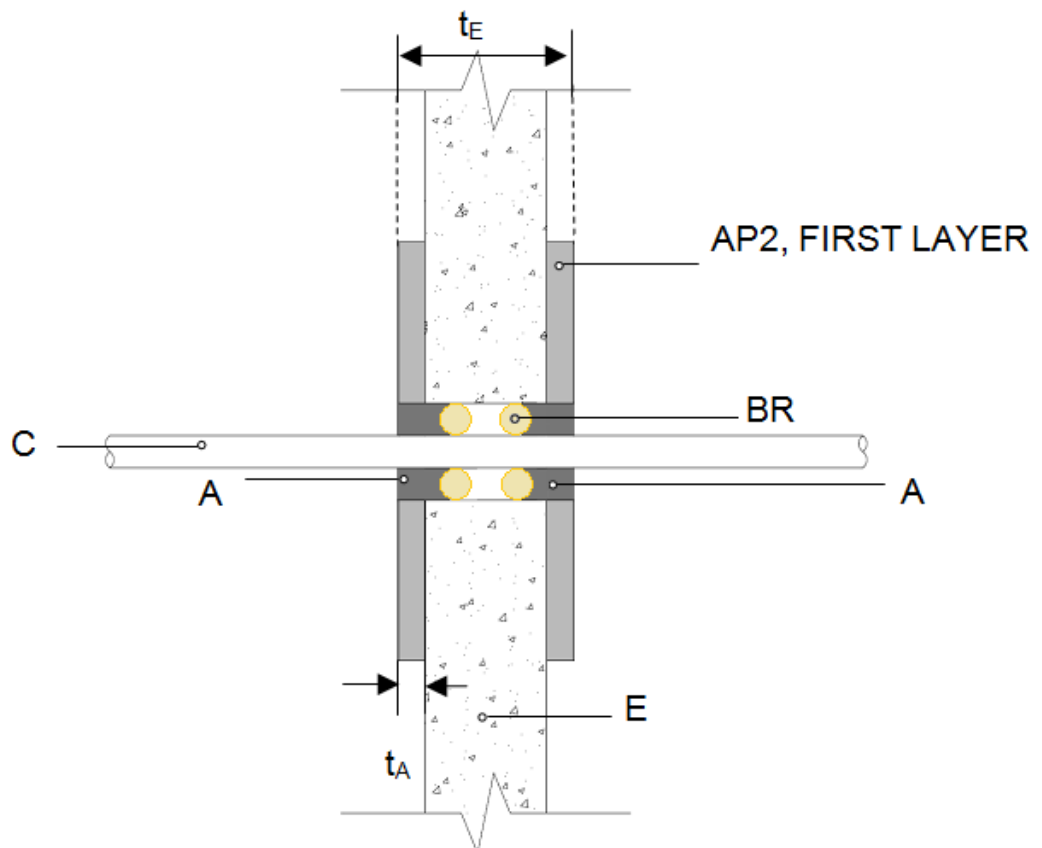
(c) - Details for PE-X Pipes in 75mm rigid wall with additional protection 1 × AP2
